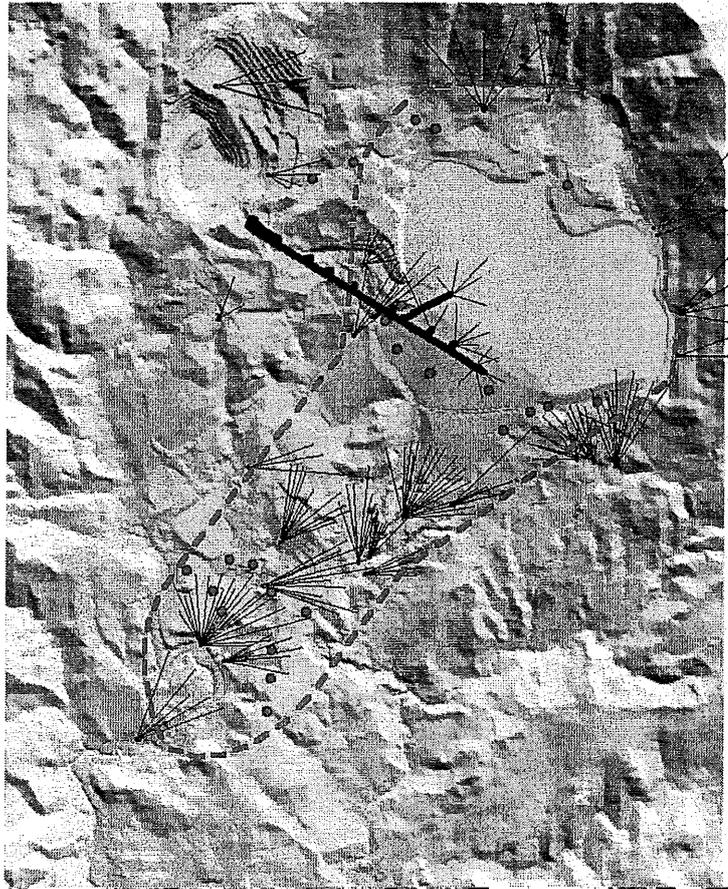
Drainage plan showing locations of horizontal drains, pumping wells, and drainage drive
